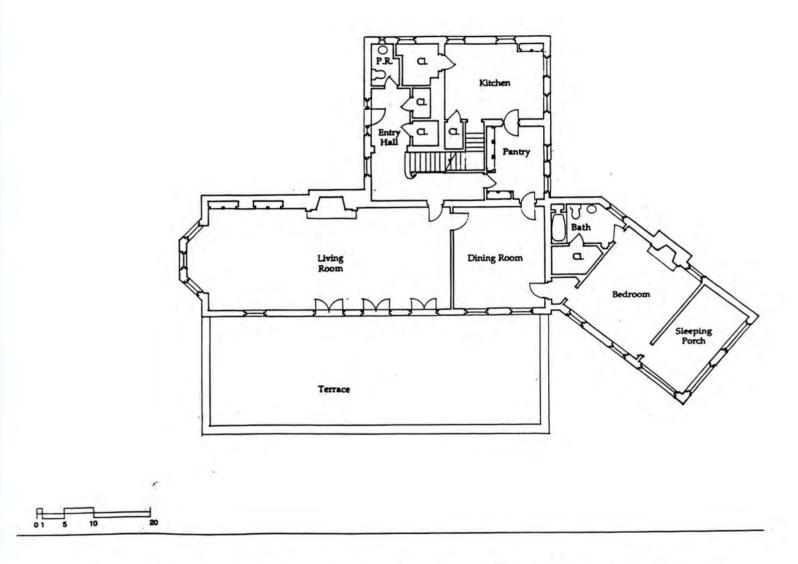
Croatan House, First Floor Plan. (Source: William McDonough, Architects, 1991).
